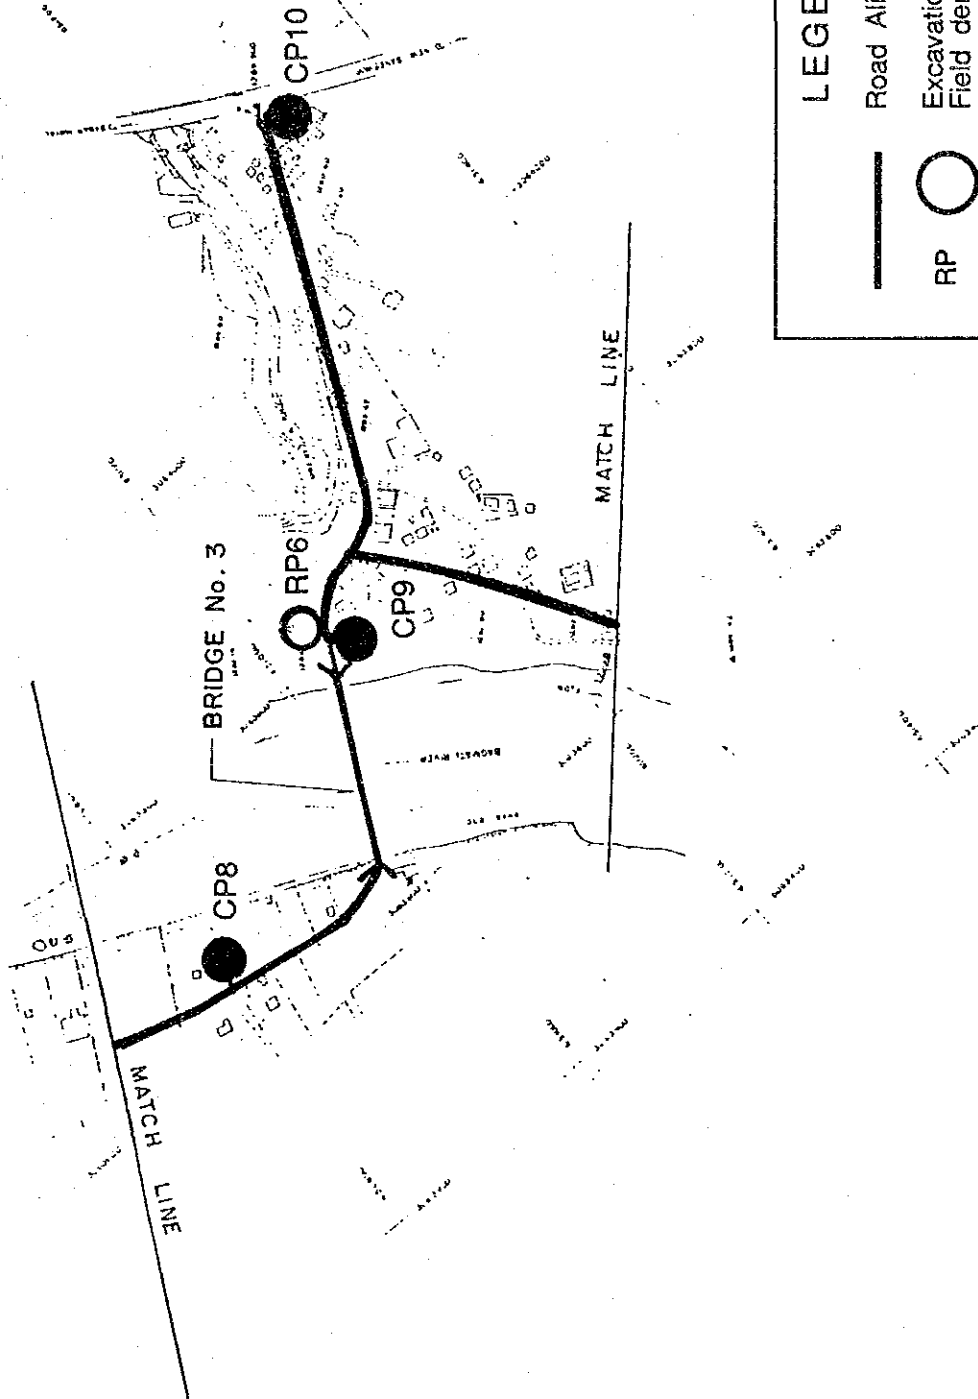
LOCATION OF ROAD PITS (3/8)
